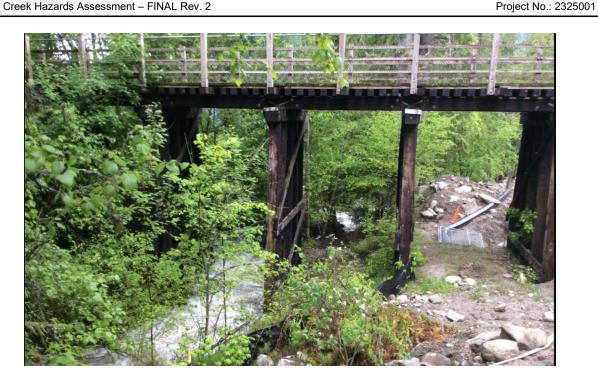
Trestle bridge over Anderson Creek near the fan apex. Wooden trestles would likely suffer major damage during a debris flood. Photo: BGC, June 12, 2022.
